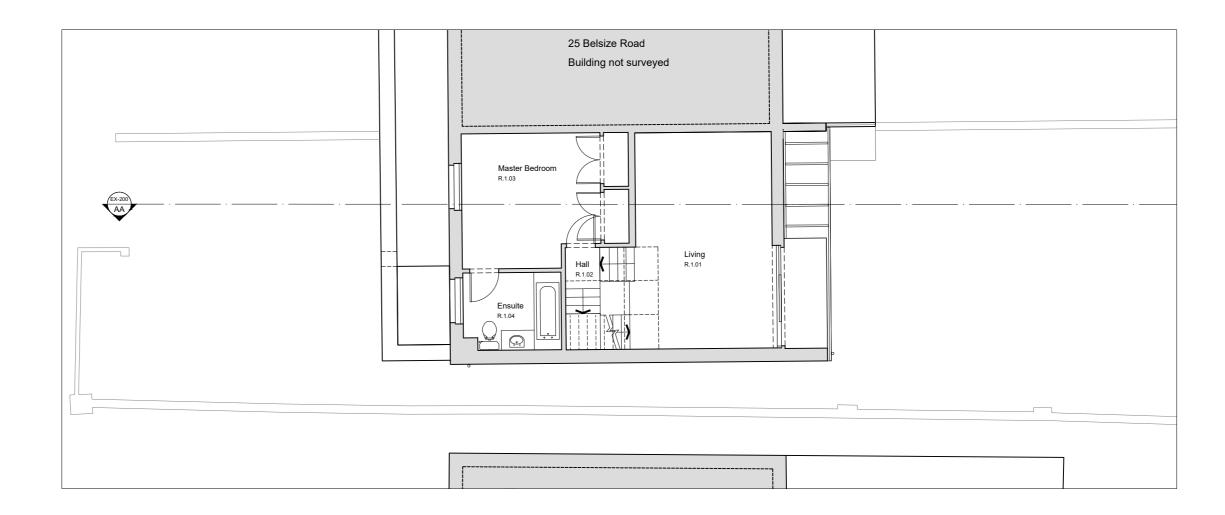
Existing First Floor Plan - Scale 1:100 @ A3
